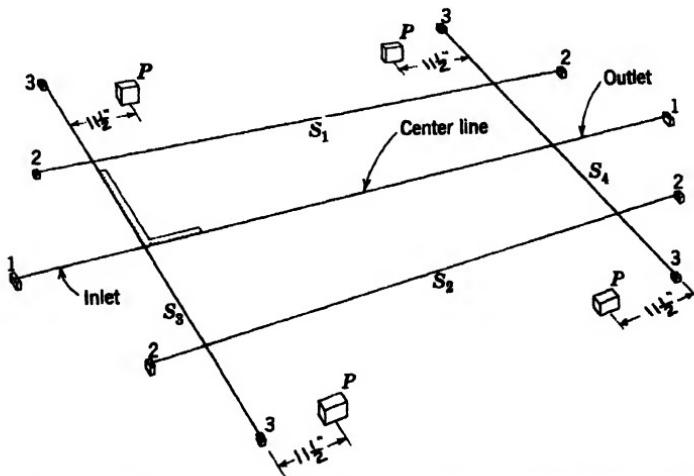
An illustration of how to lay out a pit for a septic tank using stakes and string.
